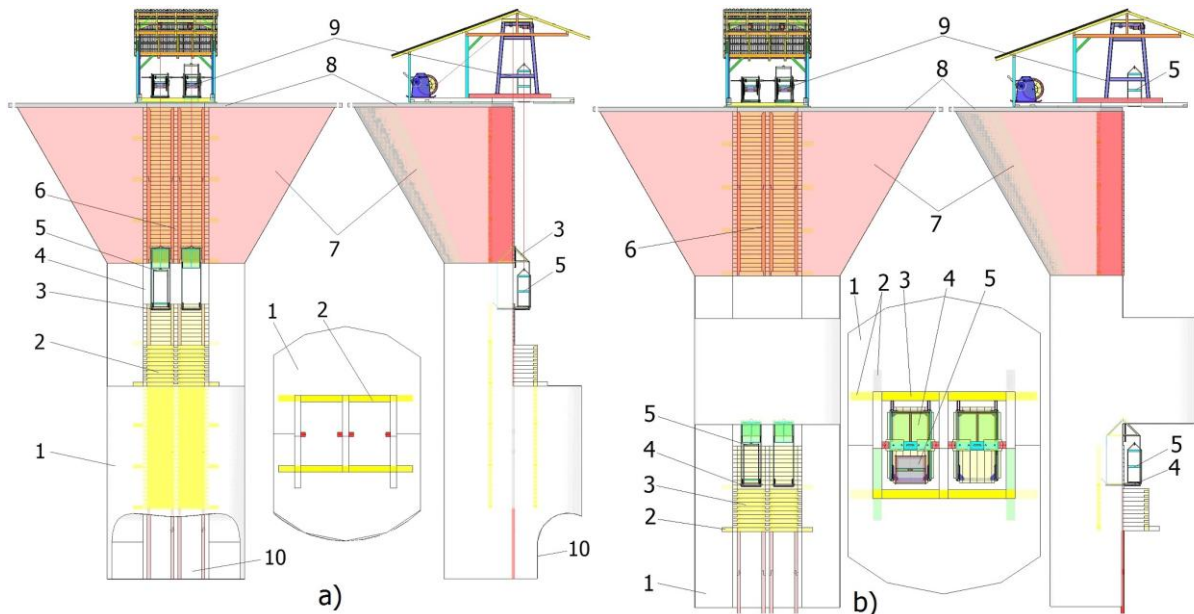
The way of using the equipment for the Carol shaft rehabilitation, by changing the wooden armature with excavation, variant IV, stage 1 and 2
